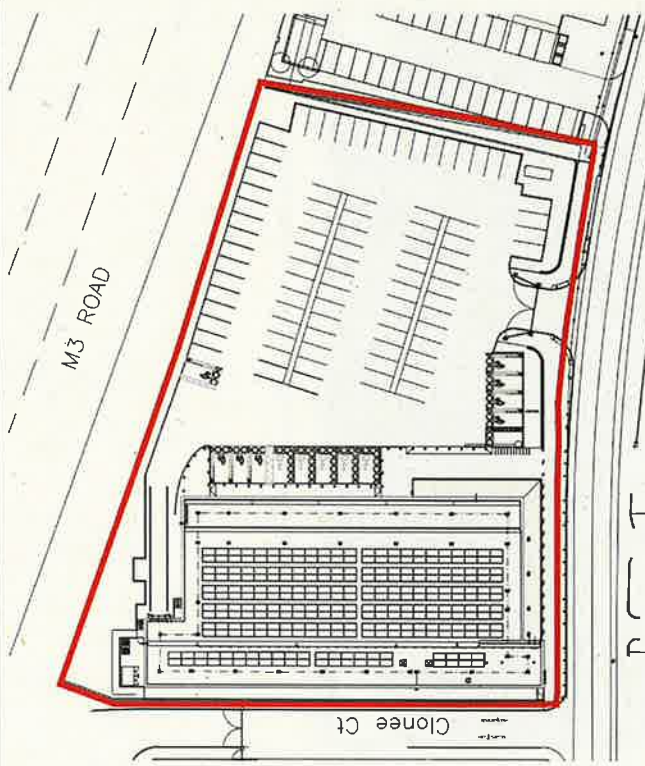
Extract from drawing no. 20984-THPK-086-XC-DR-A-0102, "Proposed Site Plan" showing the proposed site and panel layout.
